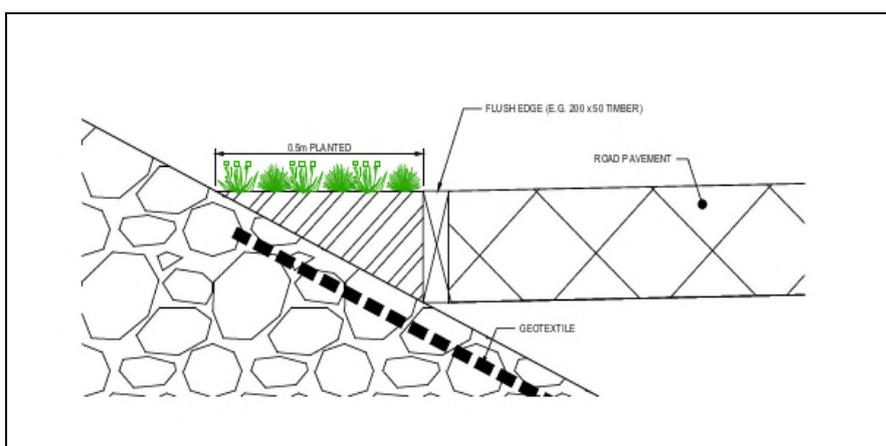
Cross-section of Revetment, Road and Passing Bay⁴
